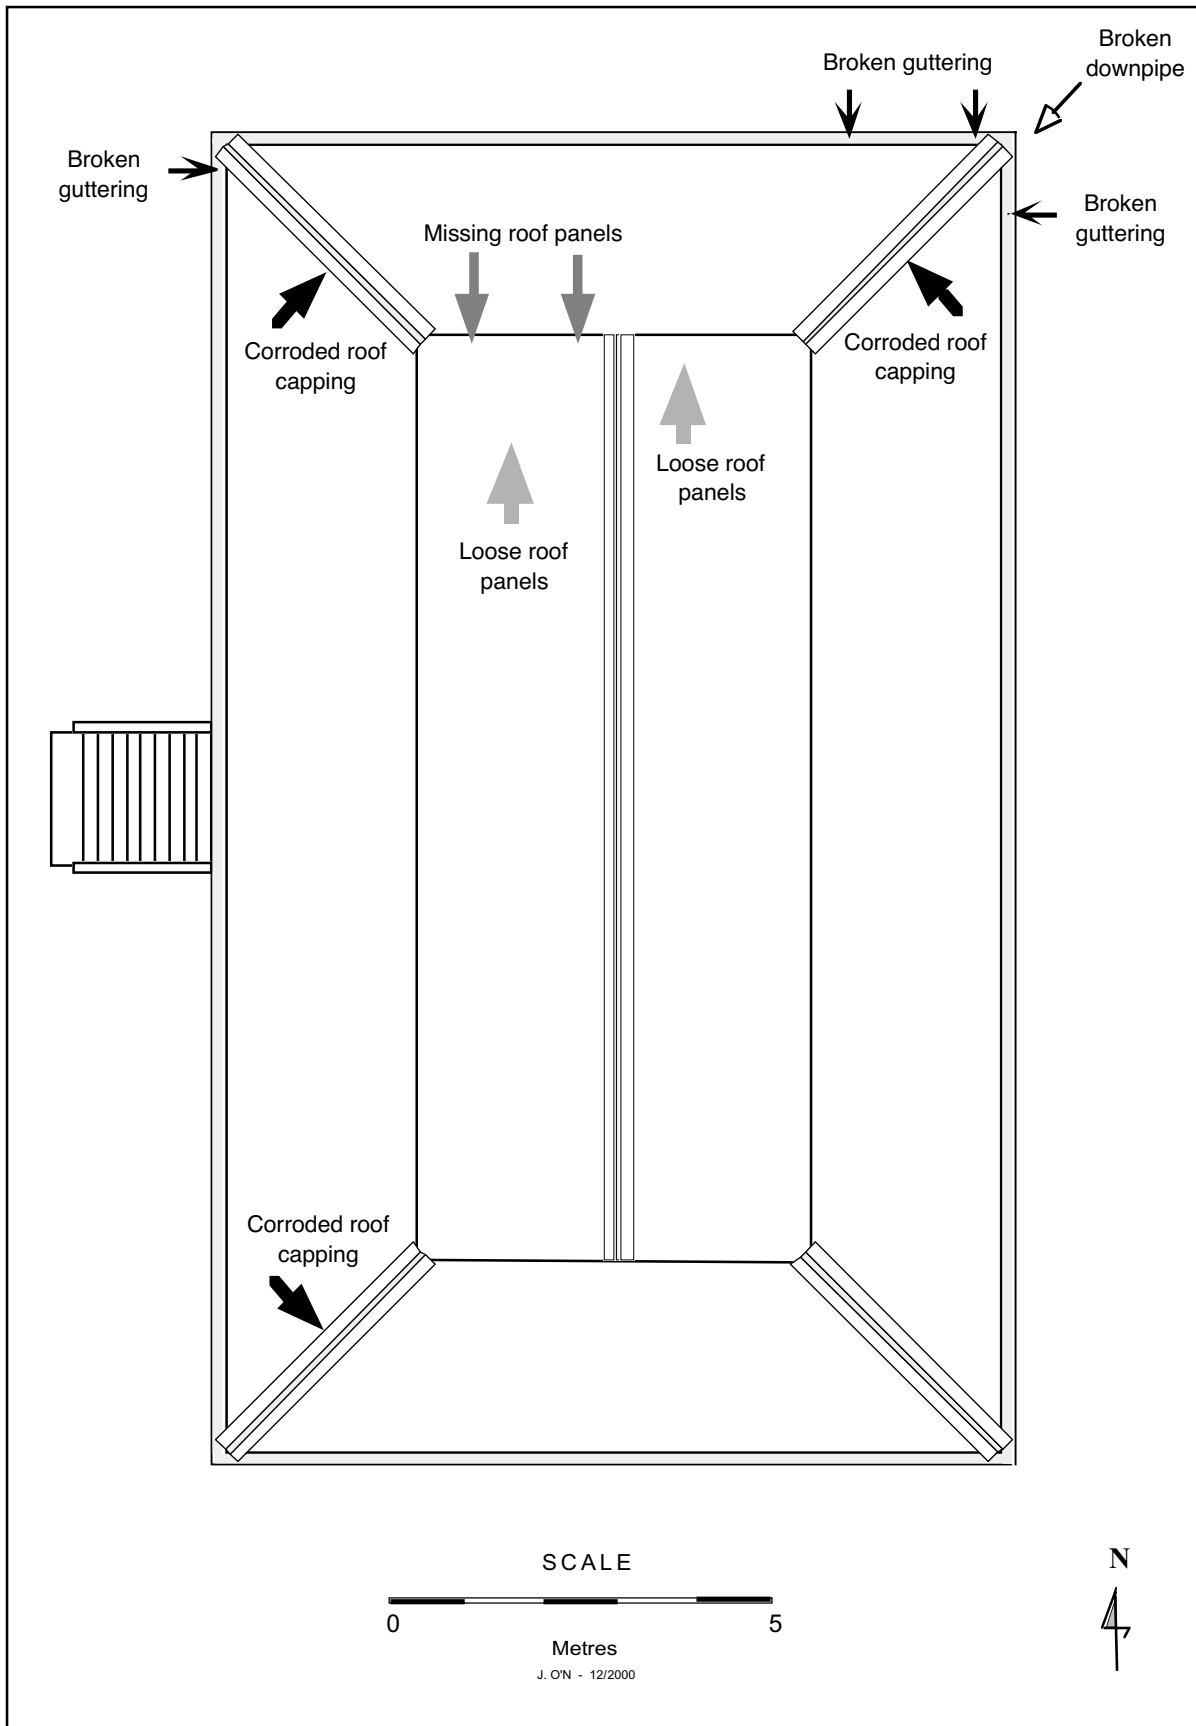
Joachim De Brum House; Roof Damage
